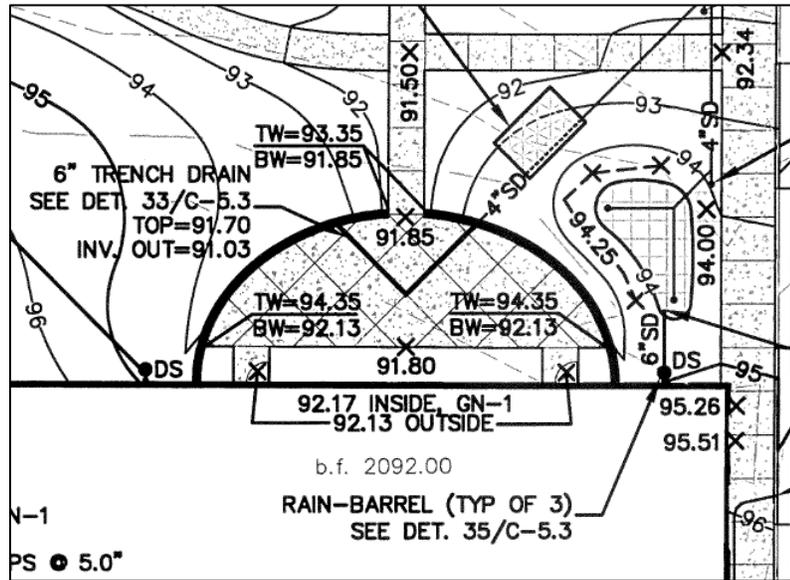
Details of stormwater management plan for Blacksburg Motor Company Building. *Source: Spectrum Design. "Blacksburg Motor Company Building Renovations C1.3."
